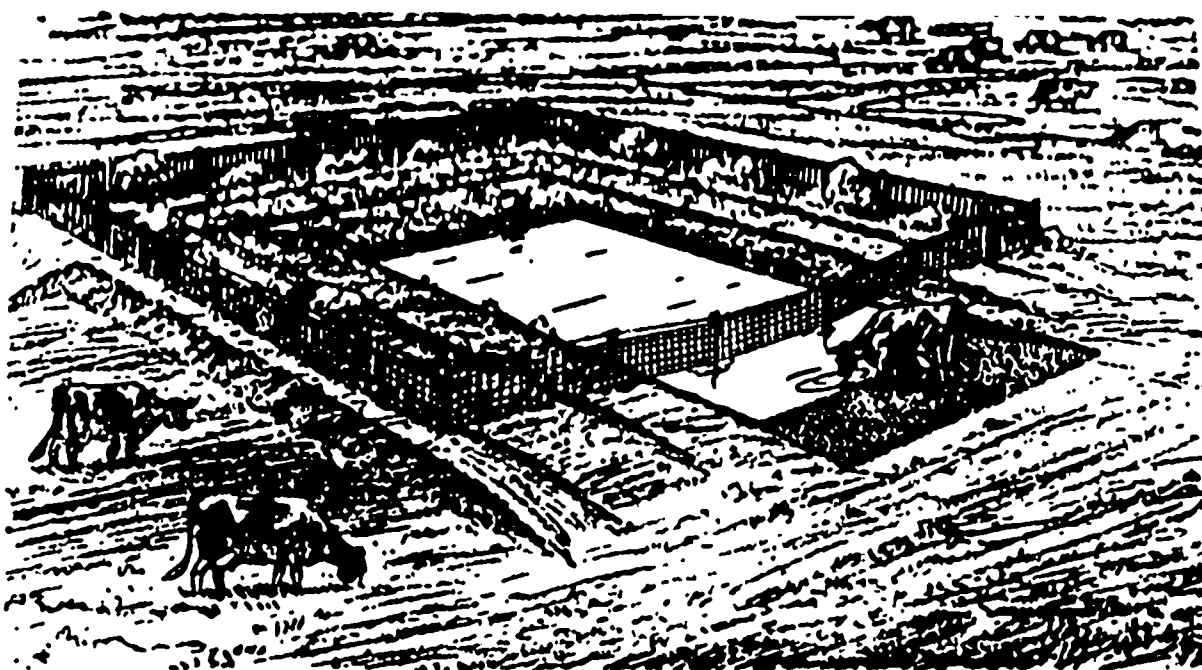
Pit Pond (U.S. Soil Conservation Service, 1969)
